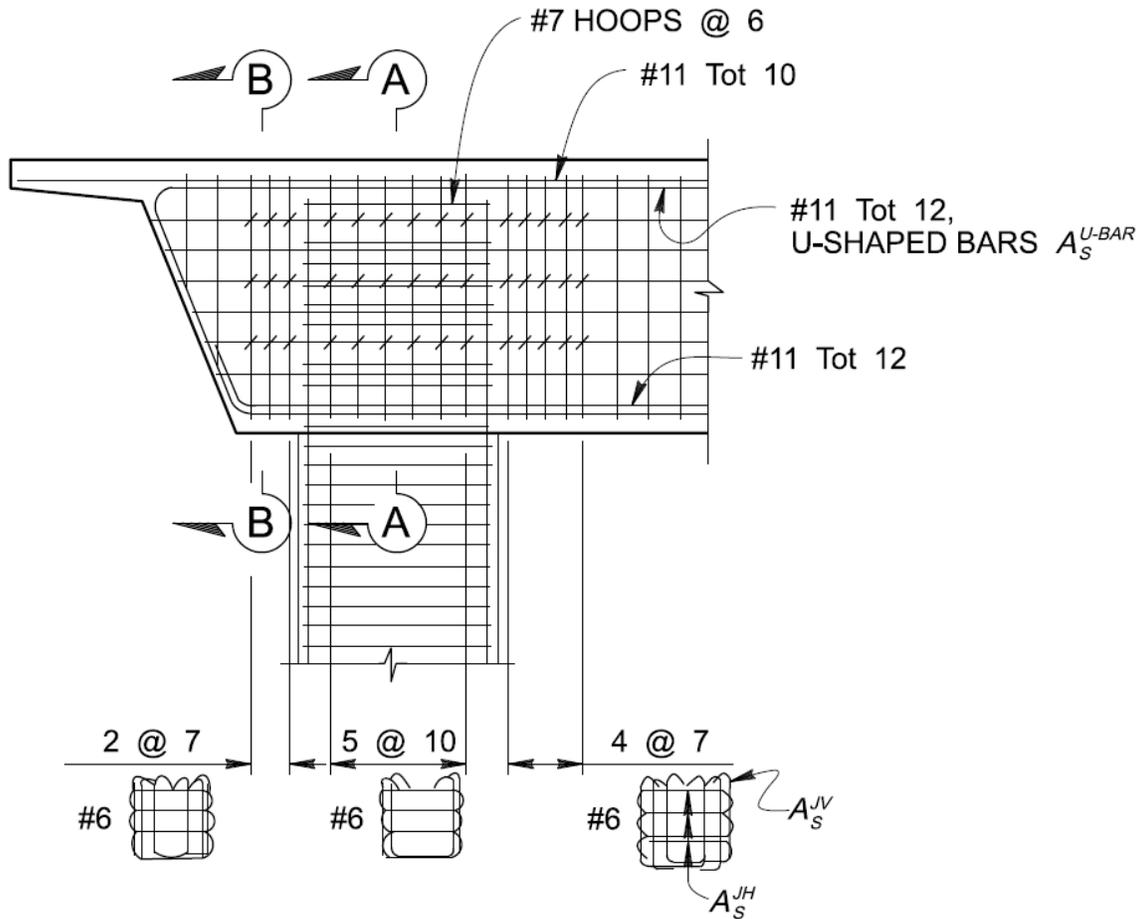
Location of Joint Shear Reinforcement (Elevation View)
